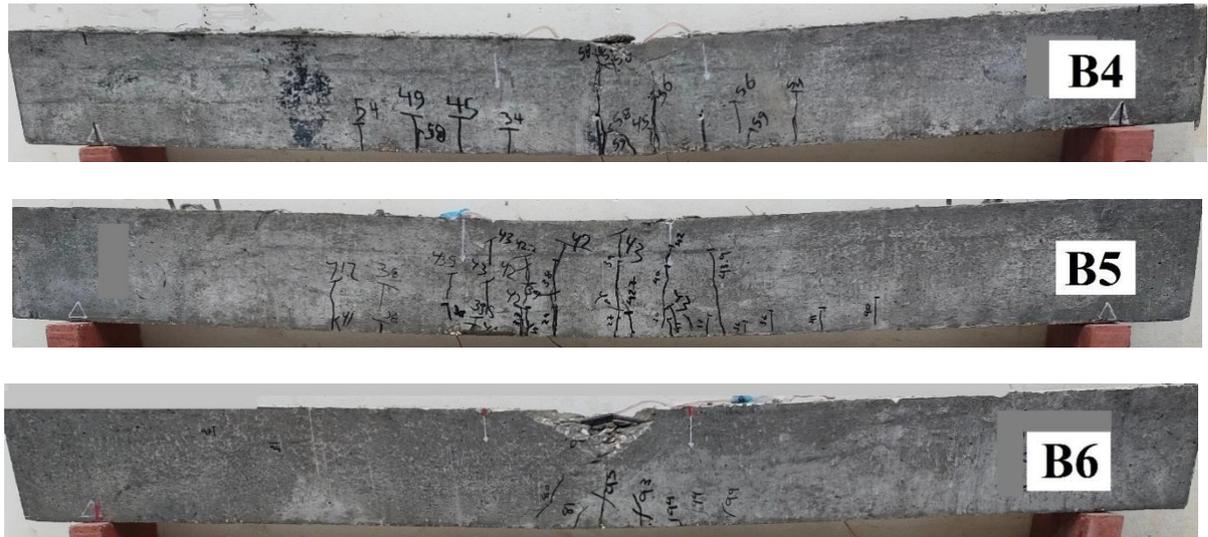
Cracking patterns and modes of failure at ultimate load for tested beams
